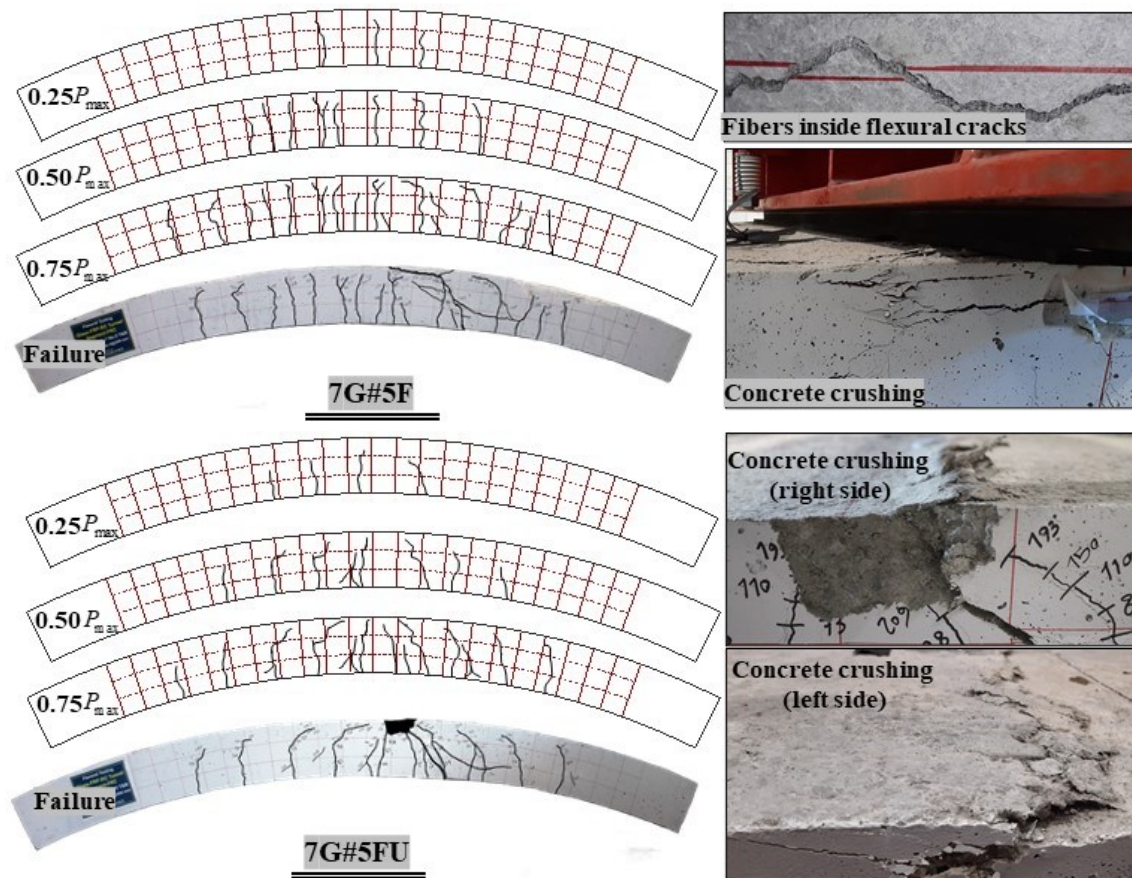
Failure modes and crack patterns of specimens 7G#5F and 7G#5FU.
